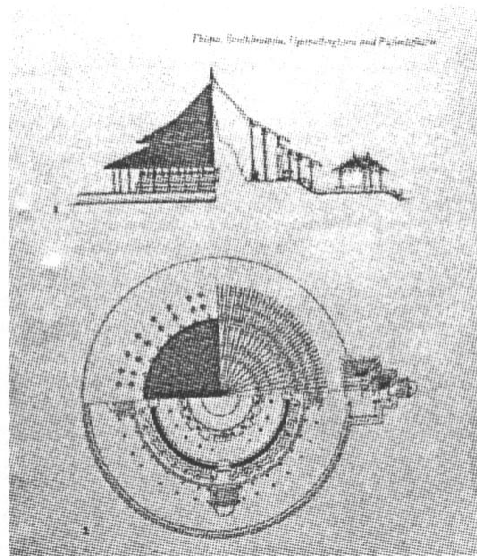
Conjectural roof reconstruction of Medirigiriya vatadage (Roland Silva)
